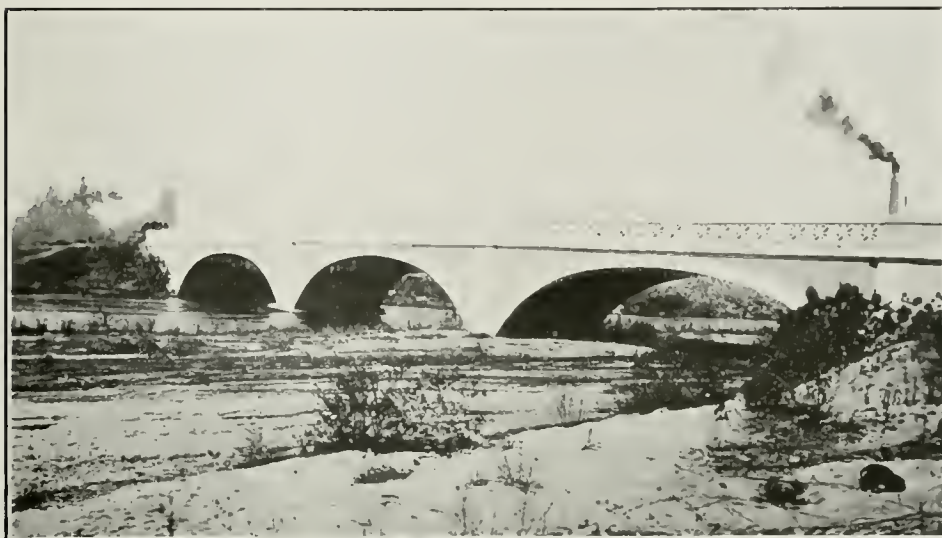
TWENTY-SIXTH STREET BRIDGE OF THE LOS ANGELES RIVER
